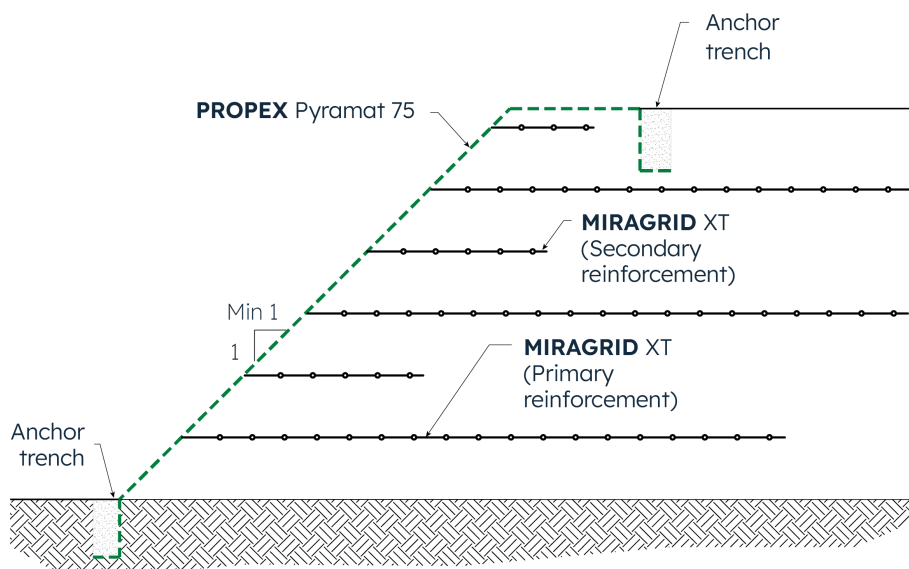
Construct reinforced backfill beyond the finished face, compacting lifts and cut back to final grade at end of construction
